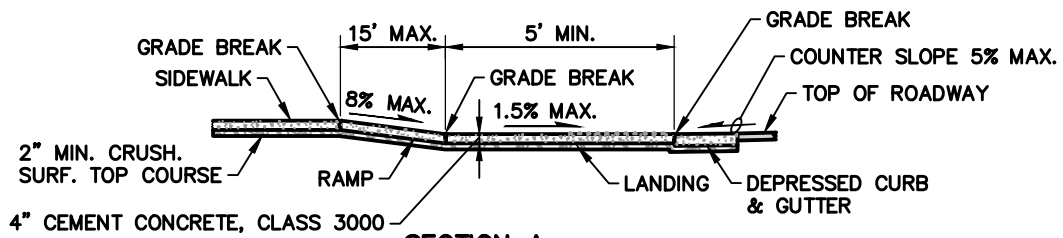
SINGLE DIRECTIONAL CURB RAMPS
